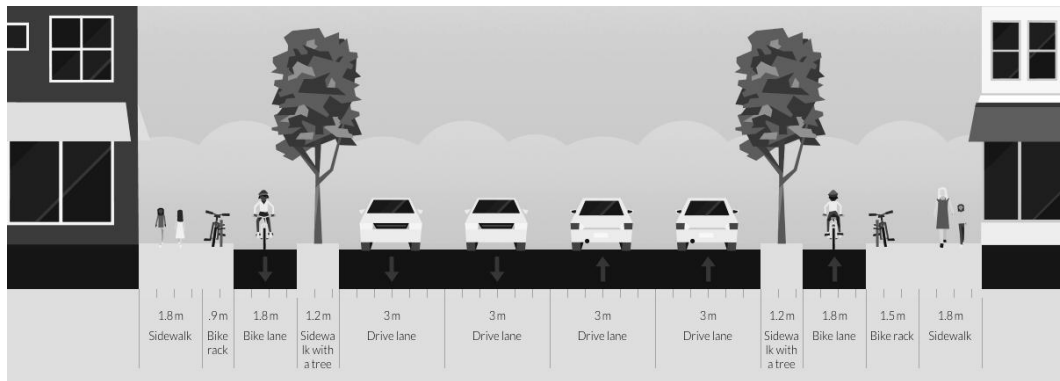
Street width: 24 m. Street consisting of sidewalks, bike lanes and racks, space for greenery and drive lanes. Designed with streetmix.net.
